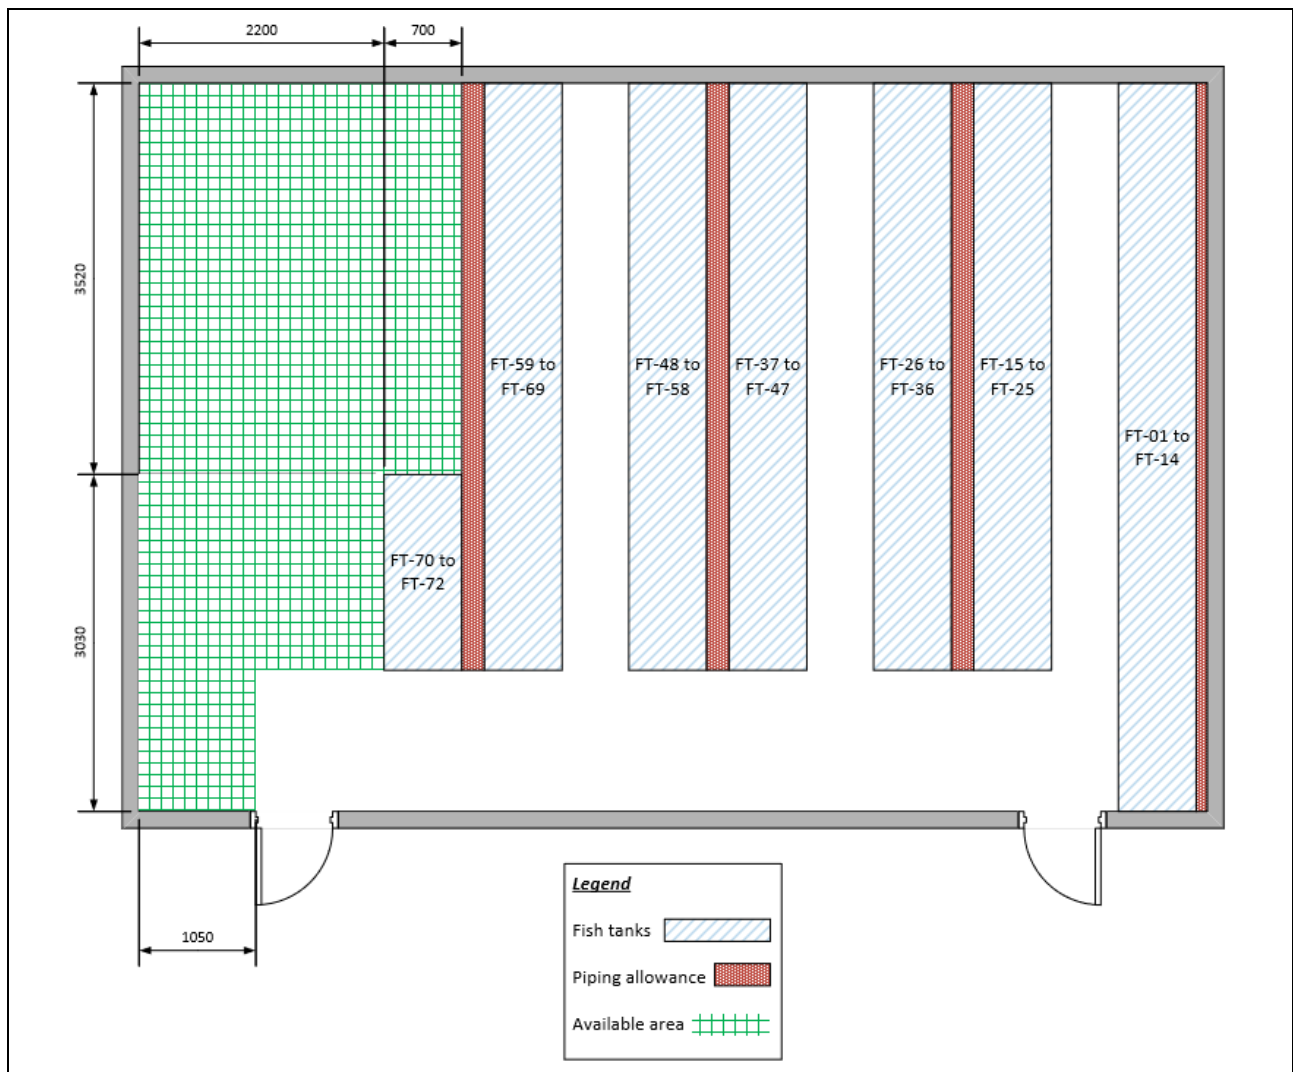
Fish tank room layout before addition of WWT equipment (top view)
